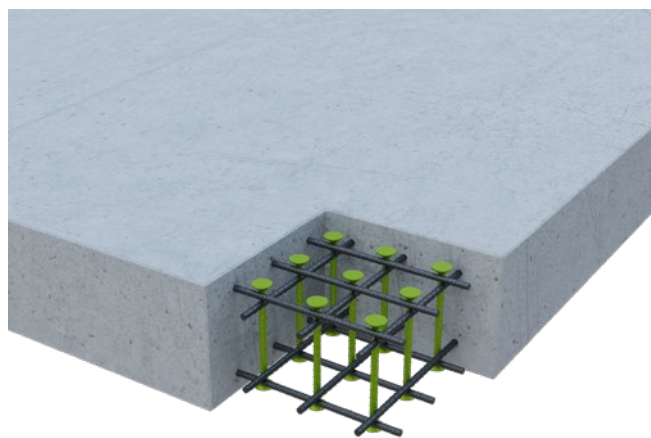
PSB® DOUBLE AS SHEAR REINFORCEMENT IN THE THIN SLAB
